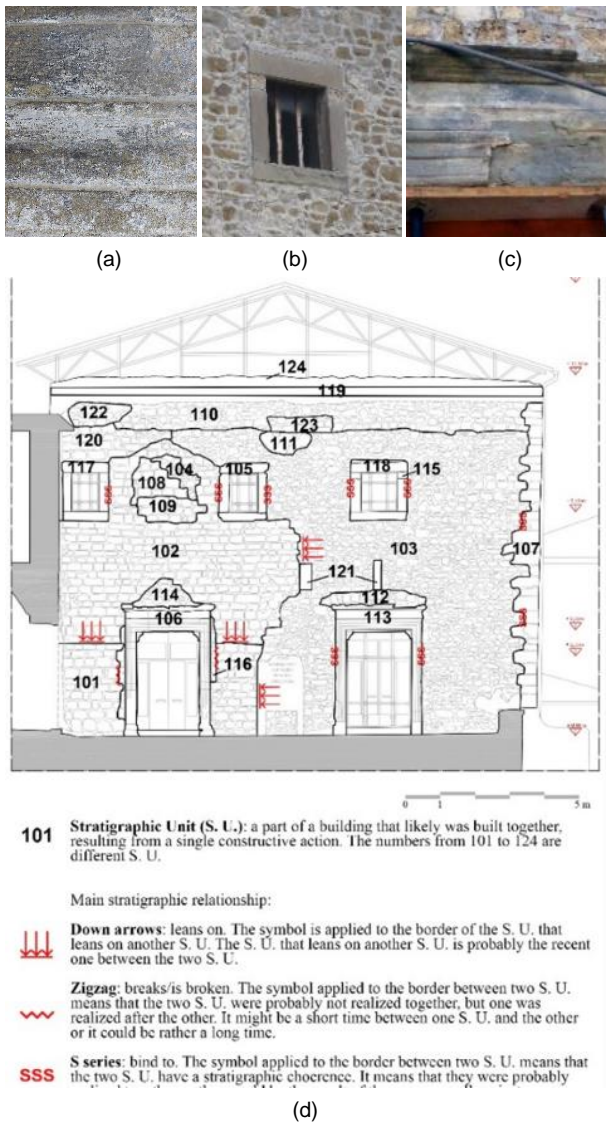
Building archaeology of St. Francesco main façade: a) Plaster finishing (113); b) Travertine stone (115) in the window frame (118); c) 1589 engraving on the southern door lintel (113); and d) SU of the main façade and its main stratigraphic relations.
